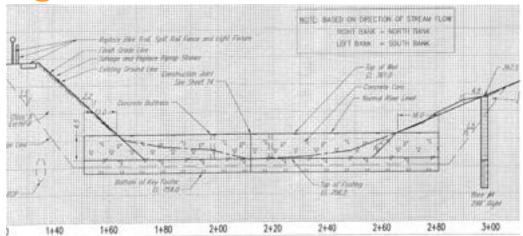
Blanchard River – Existing Inline Structure - (Section Detail)
